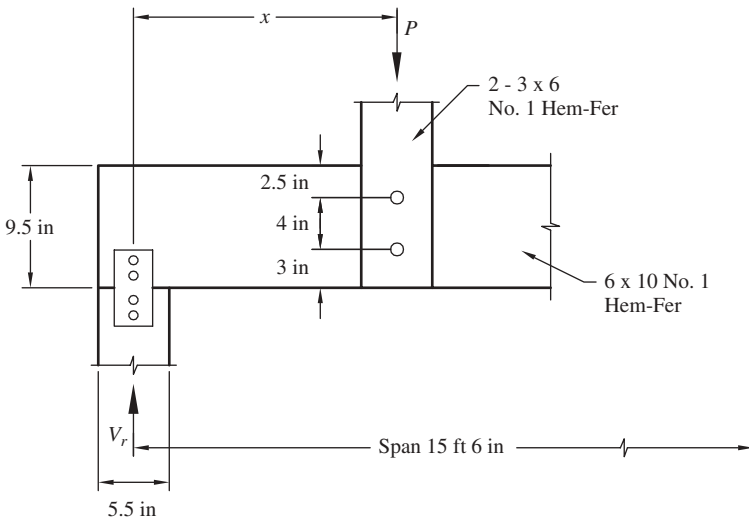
Joint detail—Example 12.2.4-1.
